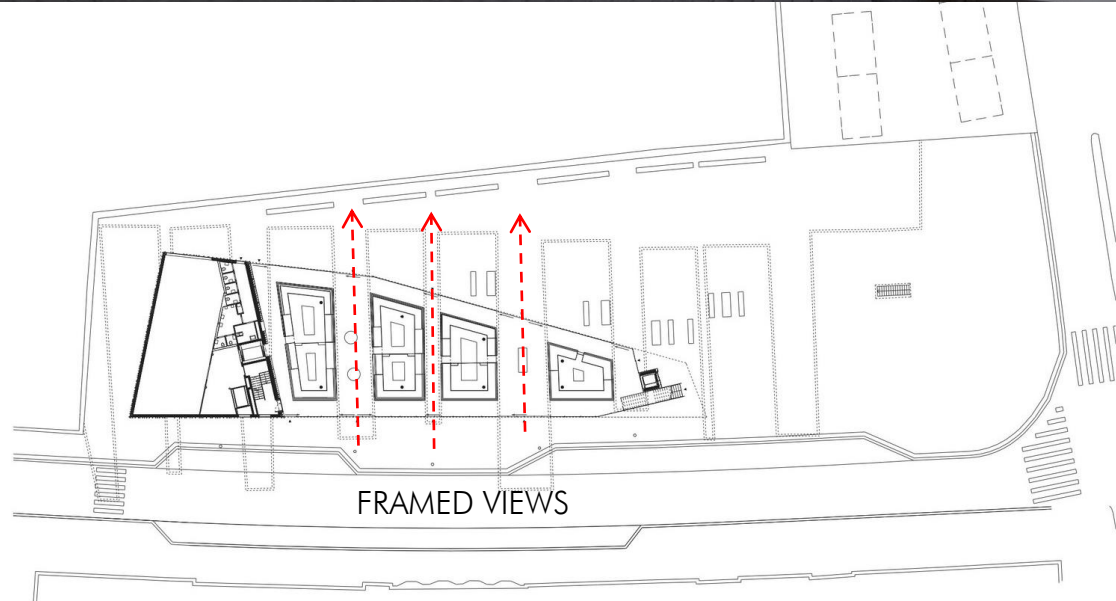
Floor plan (Sánchez, 2013: online, adapted by author).
